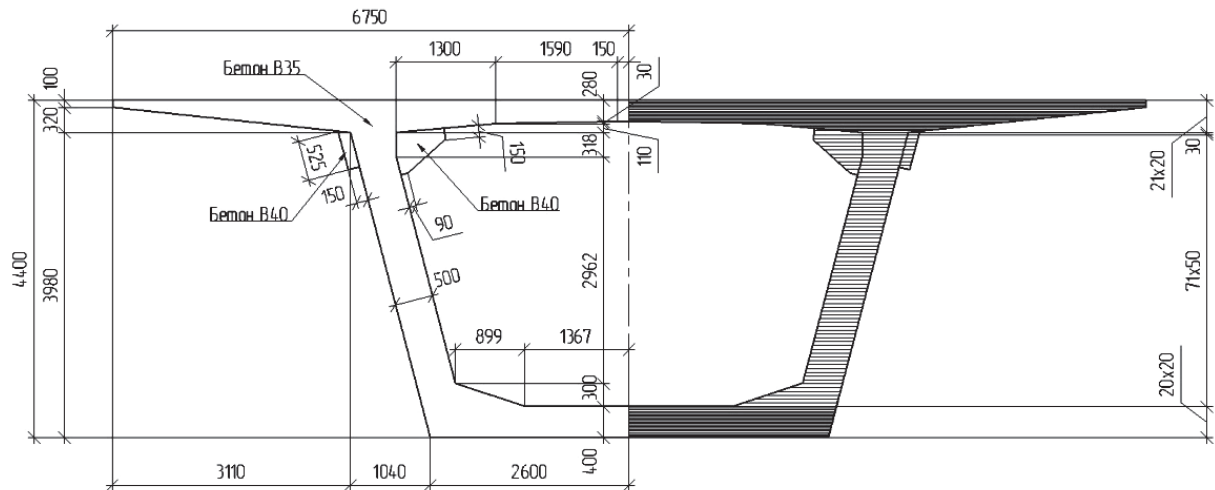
Sizes of the section of a ferroconcrete beam and division of the section into segments
